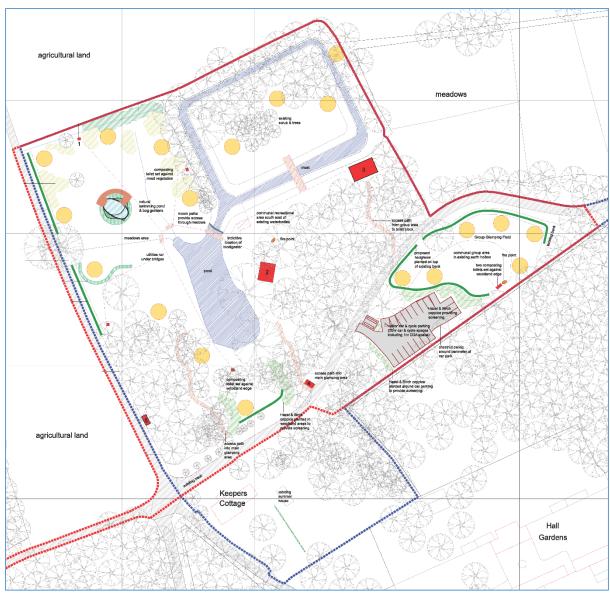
The submitted plan of grounds of Keepers Cottage, showing the proposed layout of the glamping site. Drawing by BB Landscape Design and Build.
